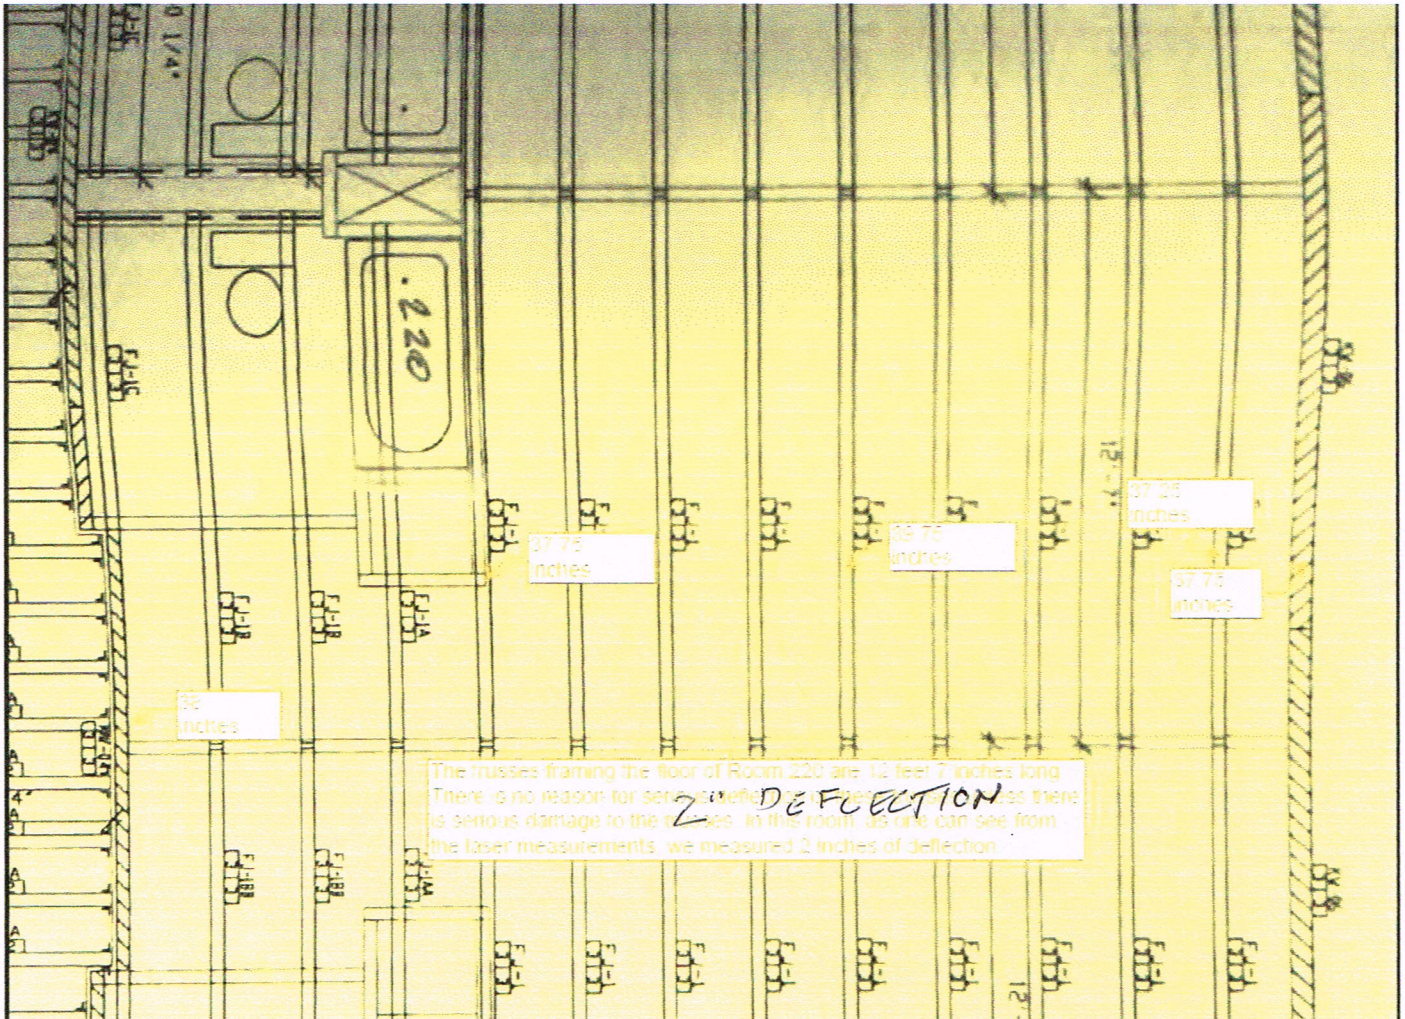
Truss Layout and Laser Level Deflection Measurements of Room 220
